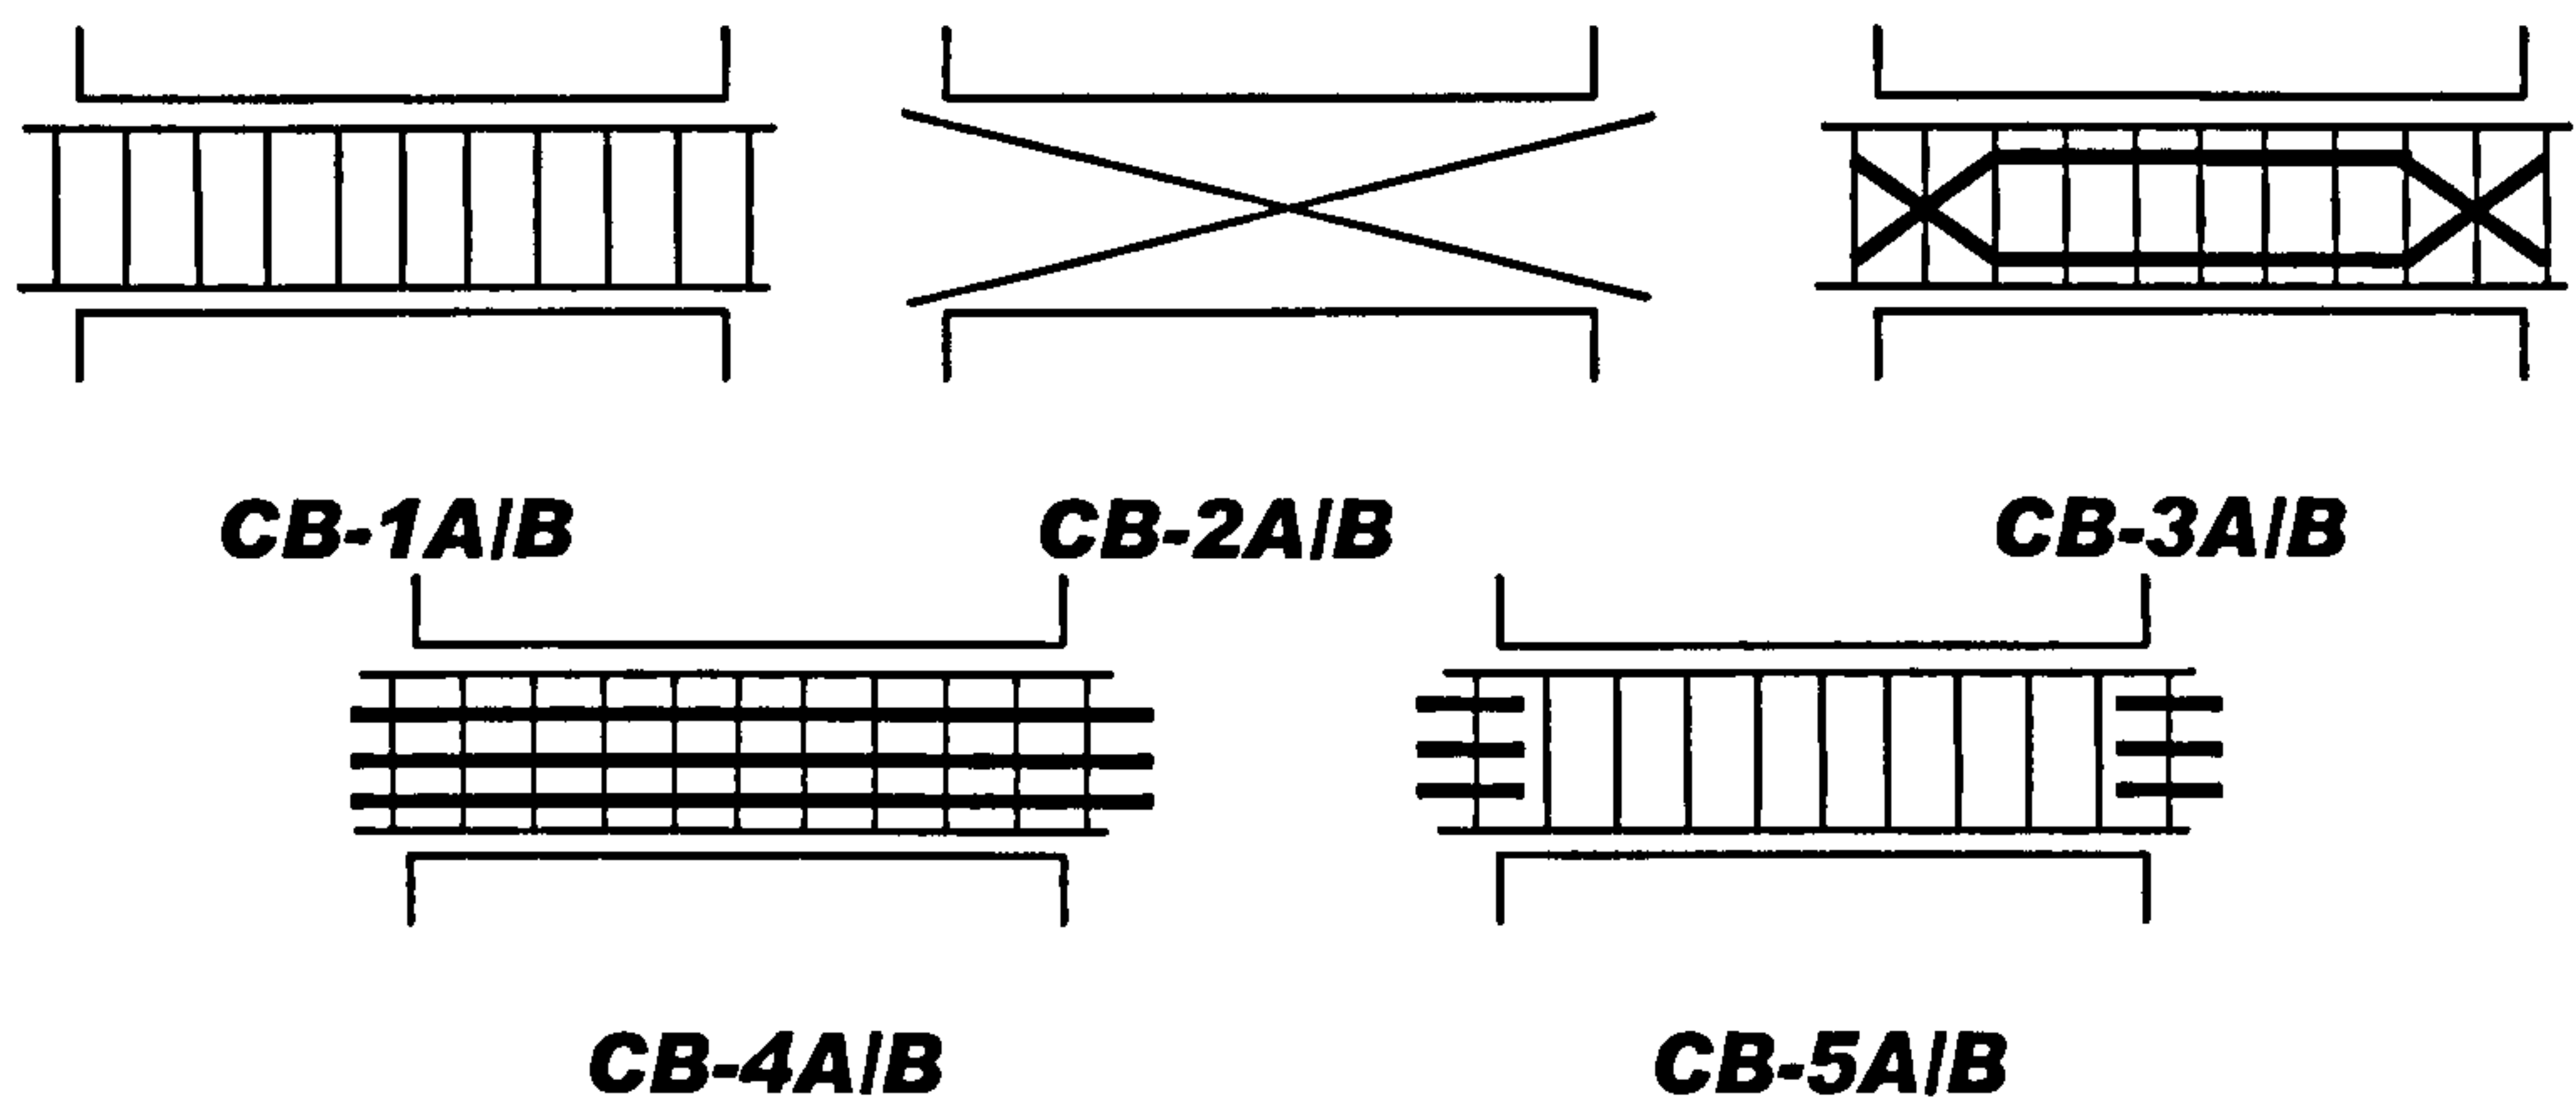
Moretti, M *et al.* concrete specimens [23]
